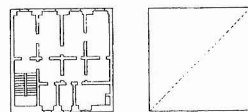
Plan of a four-window façade width building: square: 187 Prata Street. (Drawing by Jorge Mascarenhas).
